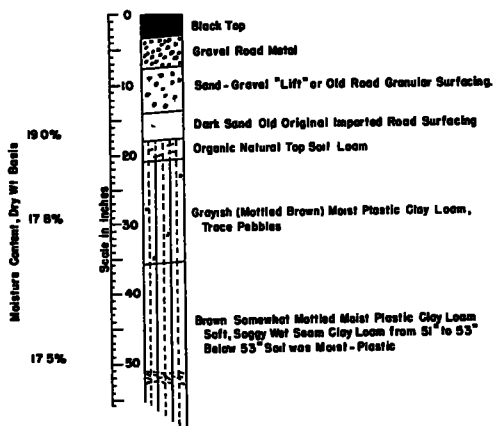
Failed Area Soil Profile, T. H. No 3-2
